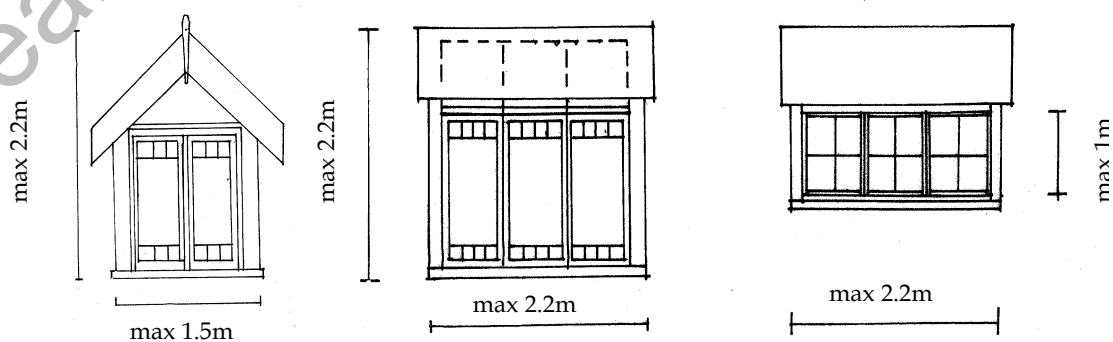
Typical dormers to Federation period cottages, semi-detached dwelling and terraces.
